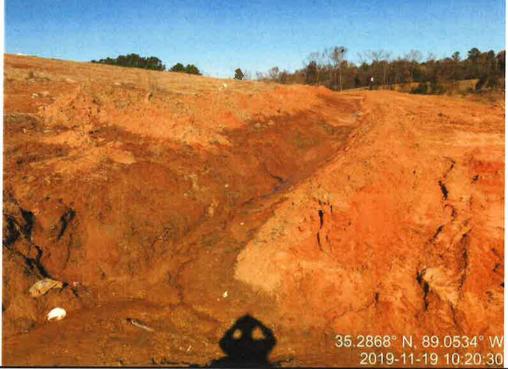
View north along the east face. Note the leachate breakout entering the run off system.
